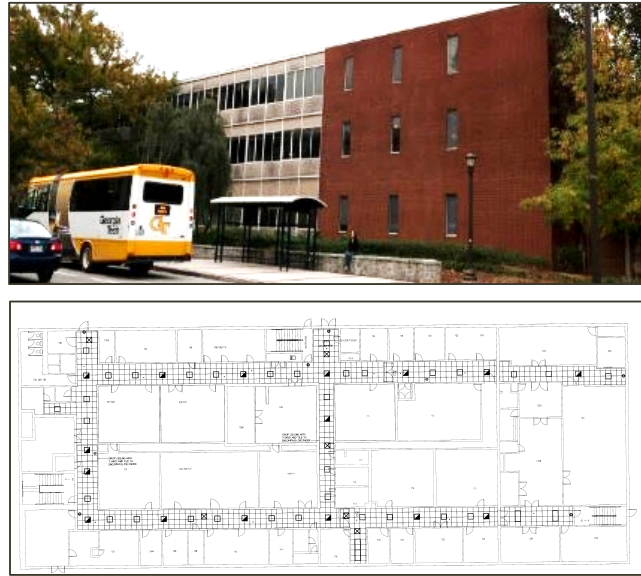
Elevation and typical floor plan of the second case building: Cherry L.
